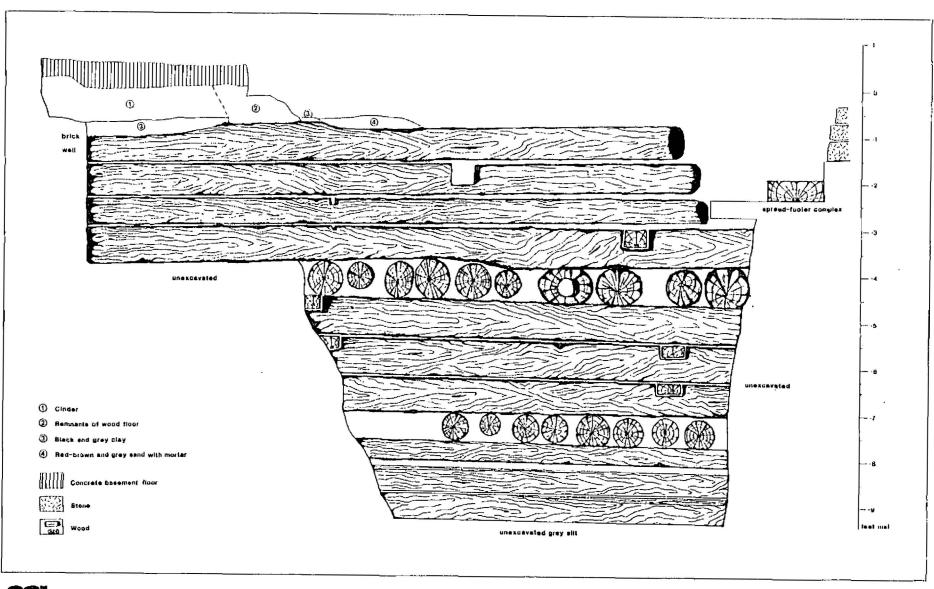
Profile, north wall of Backhoe Trench I, Section 2, in Lot 47, showing south face of "Cobb" wharf.
